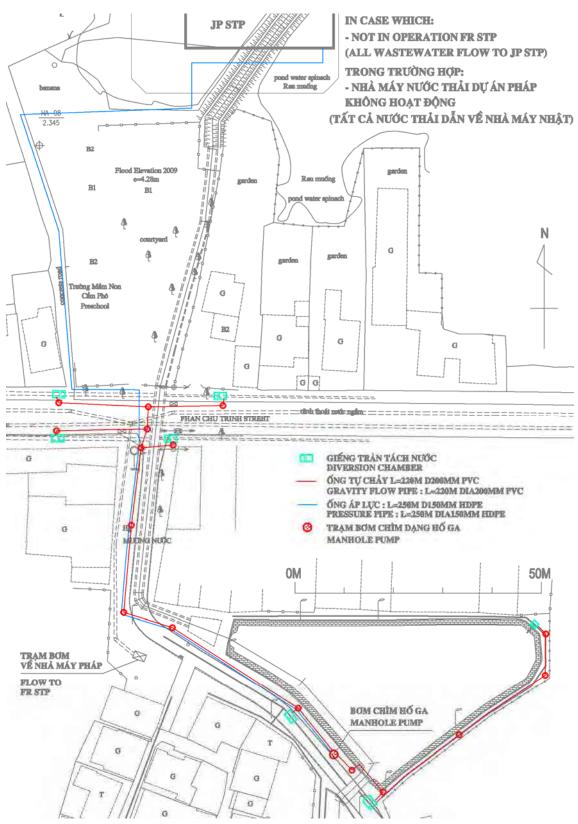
Plan view at case 1 (wastewater from the AFD project is also pumped into the treatment plant of this project)
